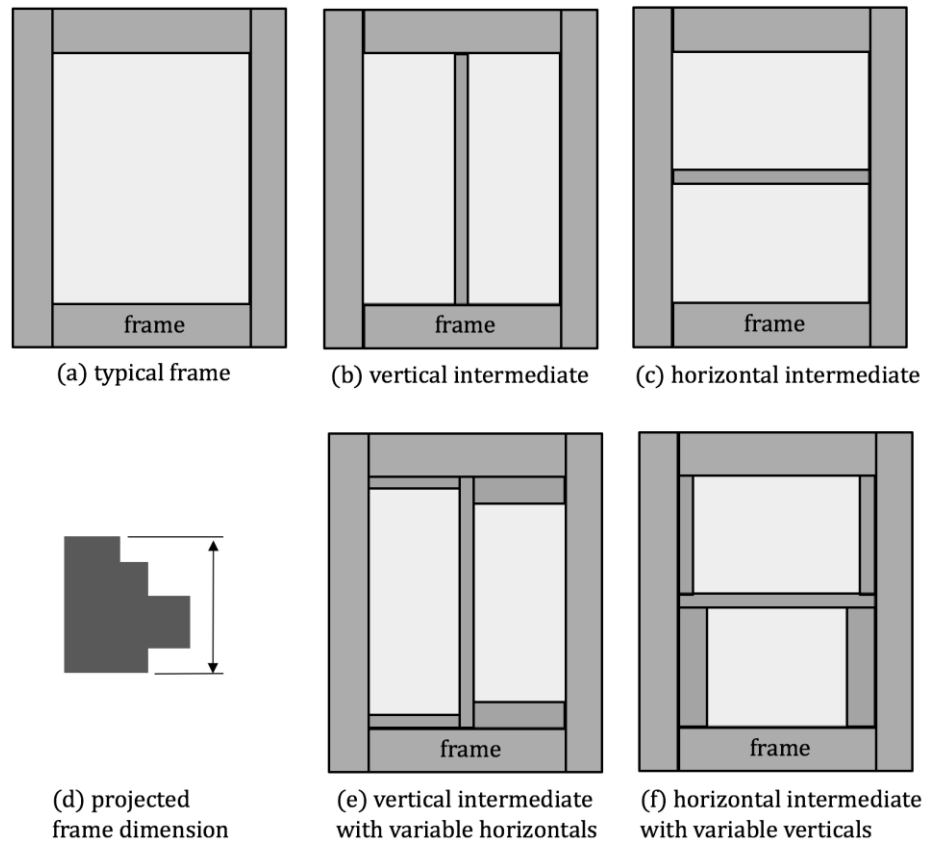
Illustration of (a) typical shade with perimeter only frame members, frame with (b) vertical intermediate framing, (c) horizontal intermediate framing, (d) the projected frame dimension used to determine height or width of the framing, (e) vertical intermediate with variable height horizontal frame, and (f) horizontal intermediate with variable width vertical frame.
